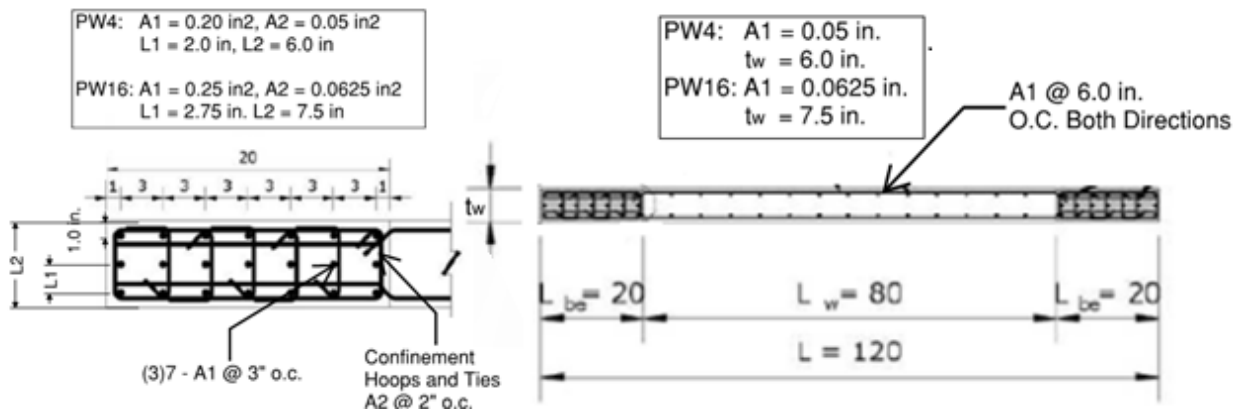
Base View of Section and Boundary Element Detail for Specimen PW4/PW16 (Birely 2012)
